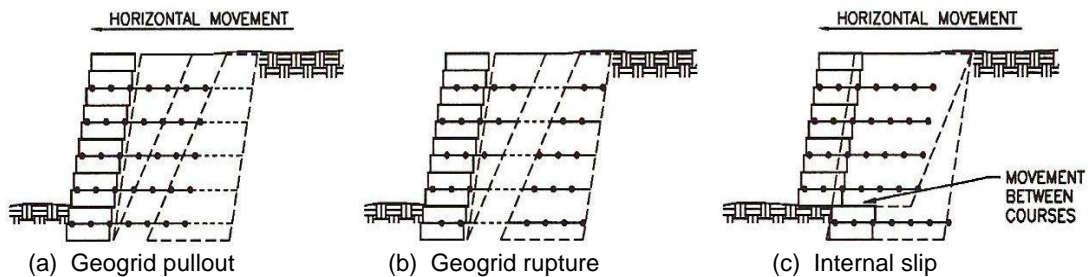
Potential internal failure modes within the reinforced zone (adapted from NCMA, 1993).
